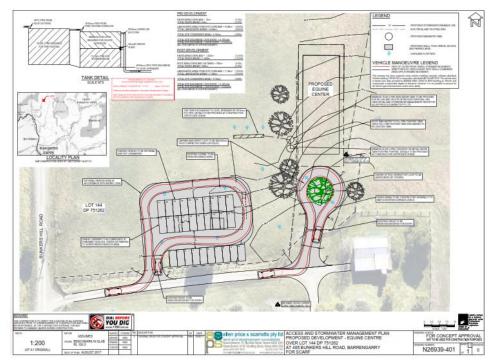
Approved Site Plan of Equine Centre from DA17/1157
